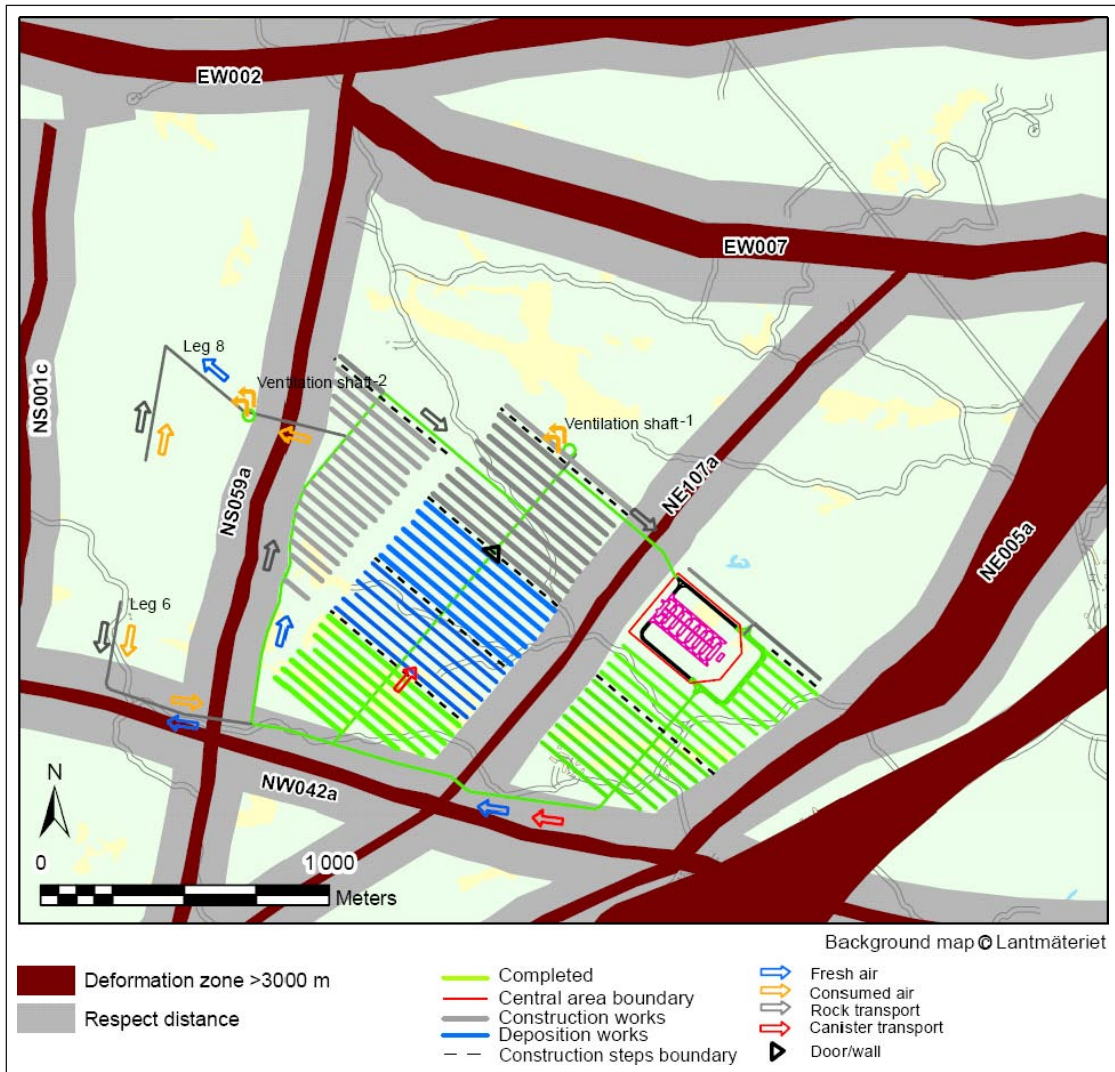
Excavation of leg 6 and 8 and in construction steps 6 and 7 and deposition works in 4 and 5.
